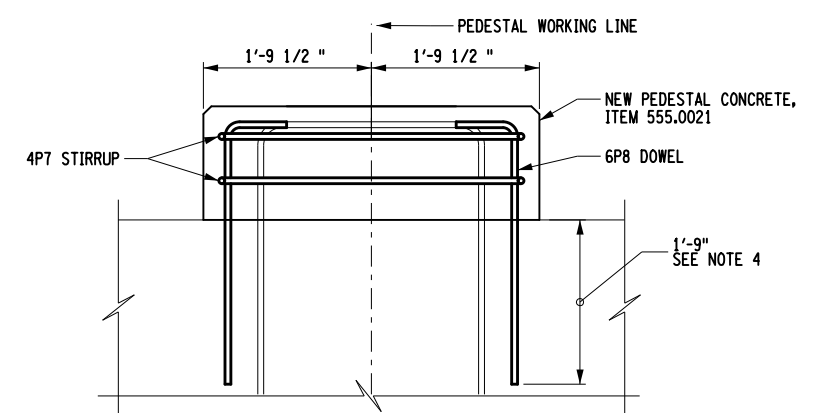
END PEDESTAL RECONSTRUCTION PLAN
